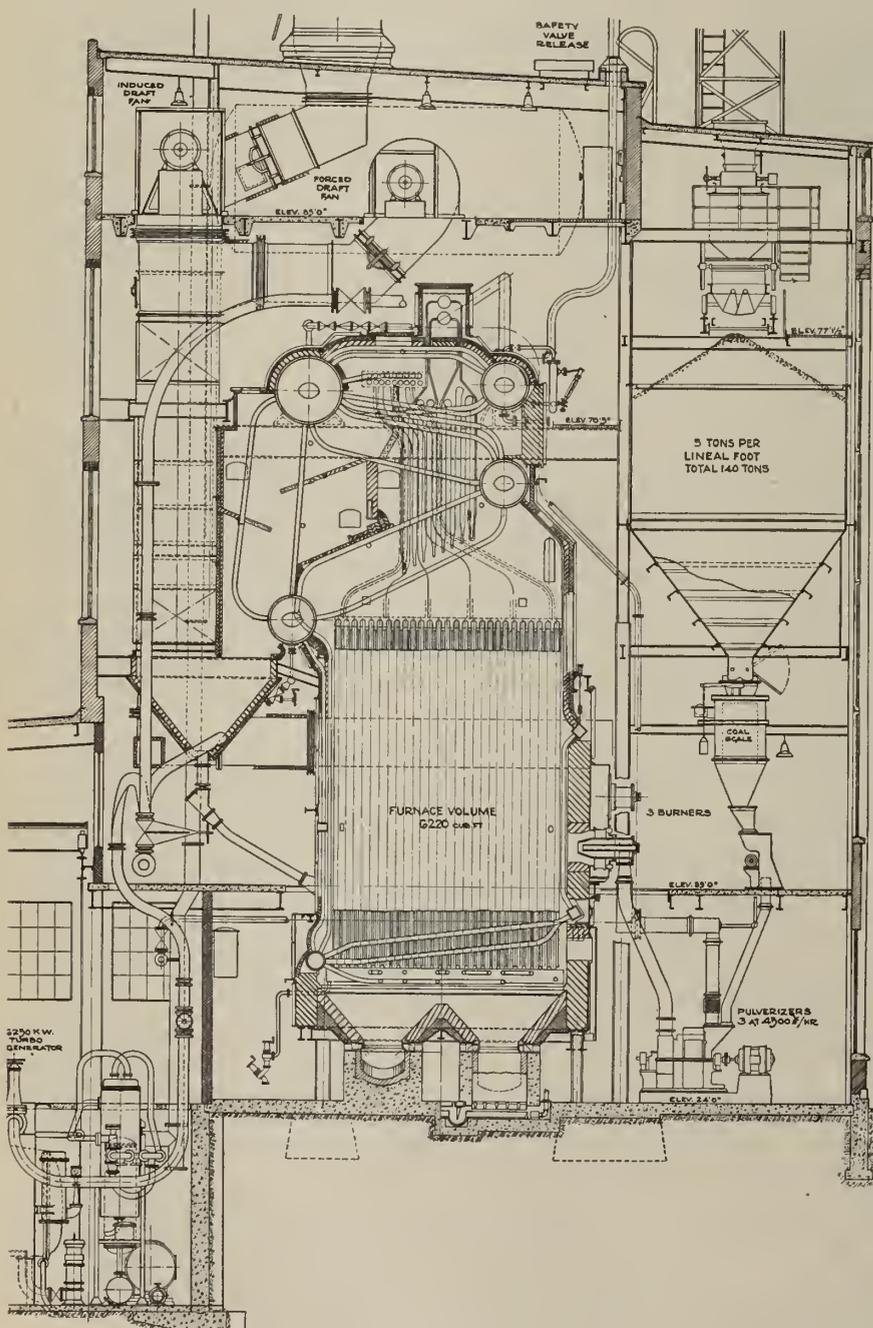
Cross Section Showing General Arrangement, No. 3 Boiler.
